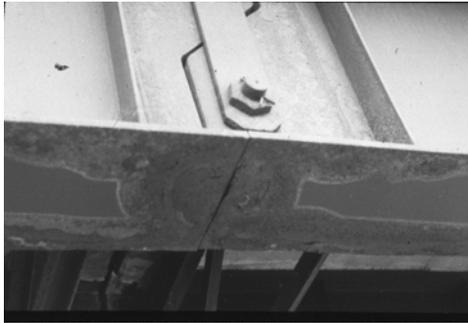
Corroded low-alloy steel bridge where protective outside film has been lost.
